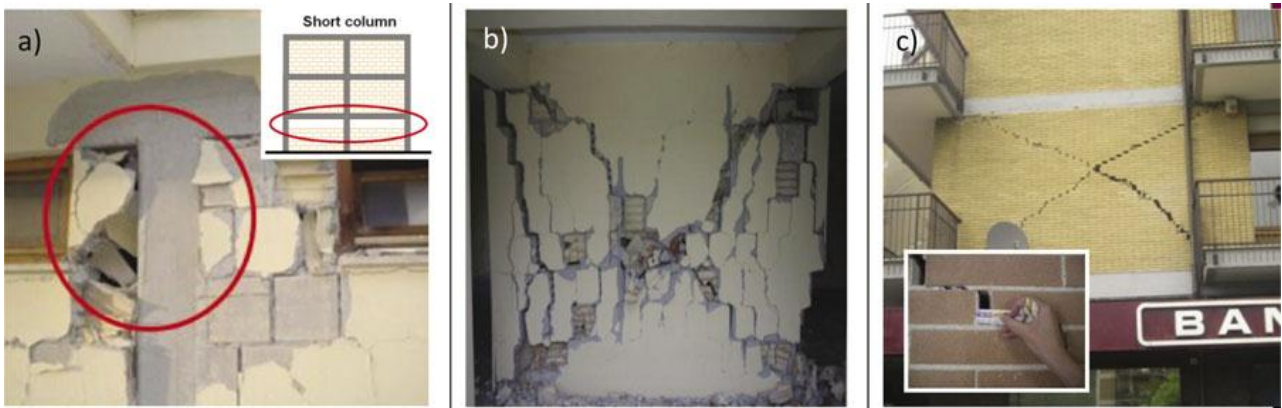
(a) Short column and corner crushing of the infill; (b) In-plane cracking and crushing of masonry wall (c) Horizontal bed joint sliding [1] L'Aquila.
